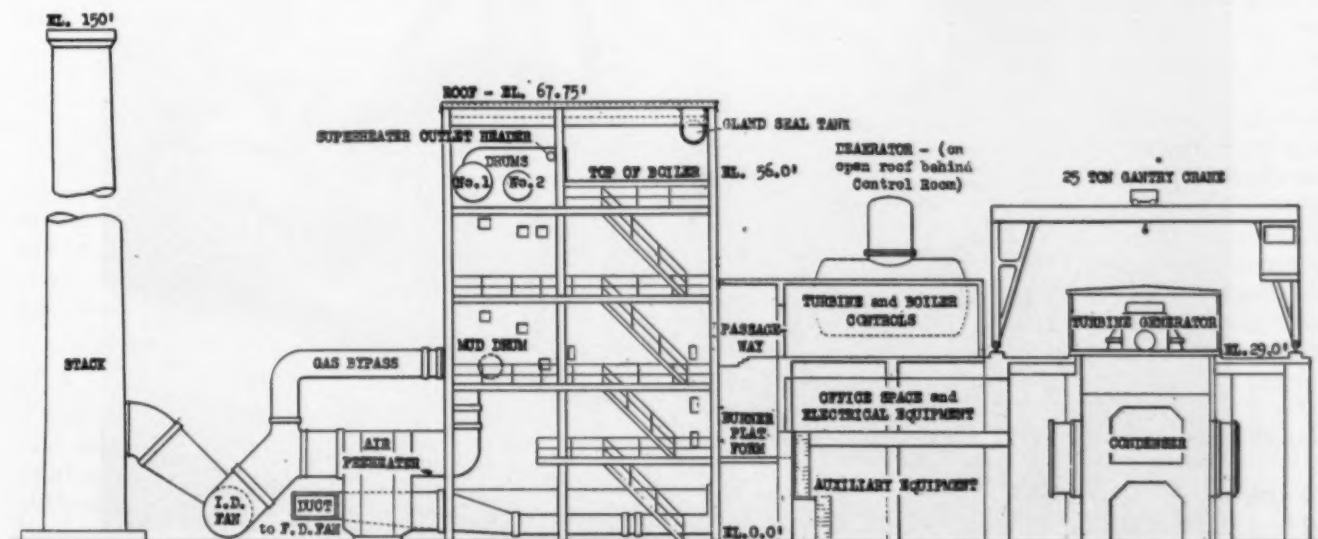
Sectional elevation of recent semi-outdoor steam plant
